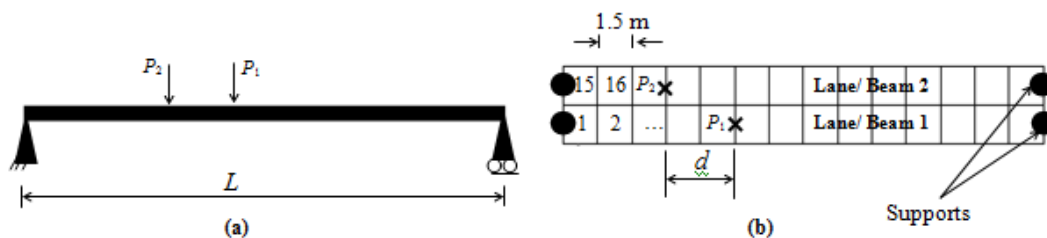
Schematic of bridge with assumed segments: (a) elevation, (b) plan
